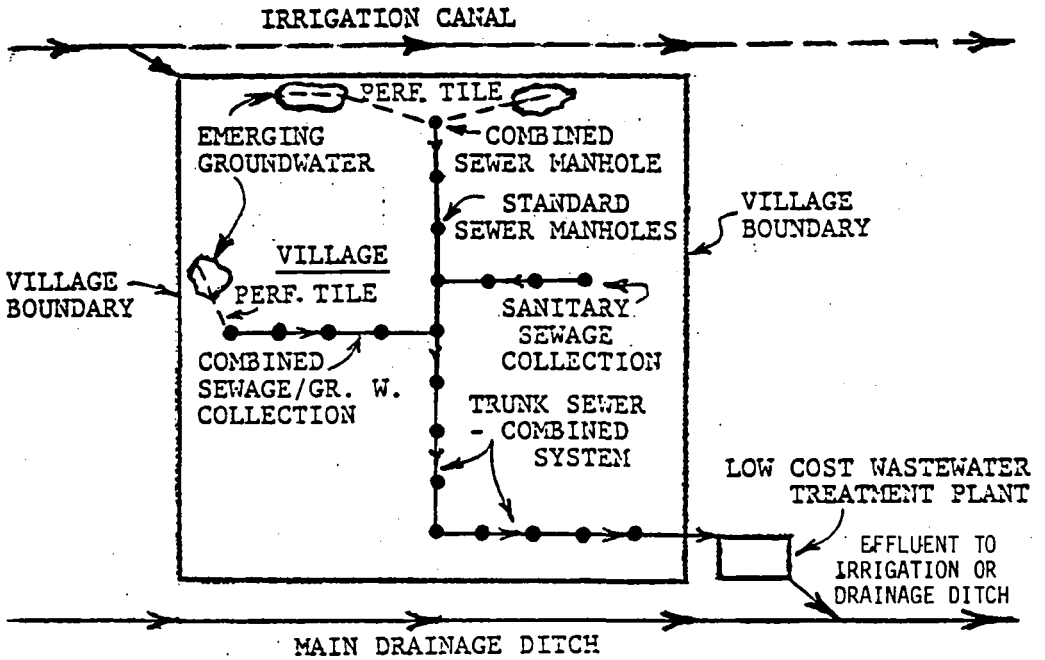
SCHEMATIC DIAGRAM OF PROPOSED TYPICAL VILLAGE COMBINED DRAINAGE COLLECTION AND TREATMENT SYSTEM
